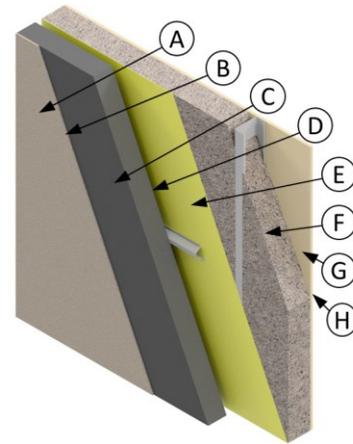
Wall with autoclaved aerated concrete (AAC) cladding.
